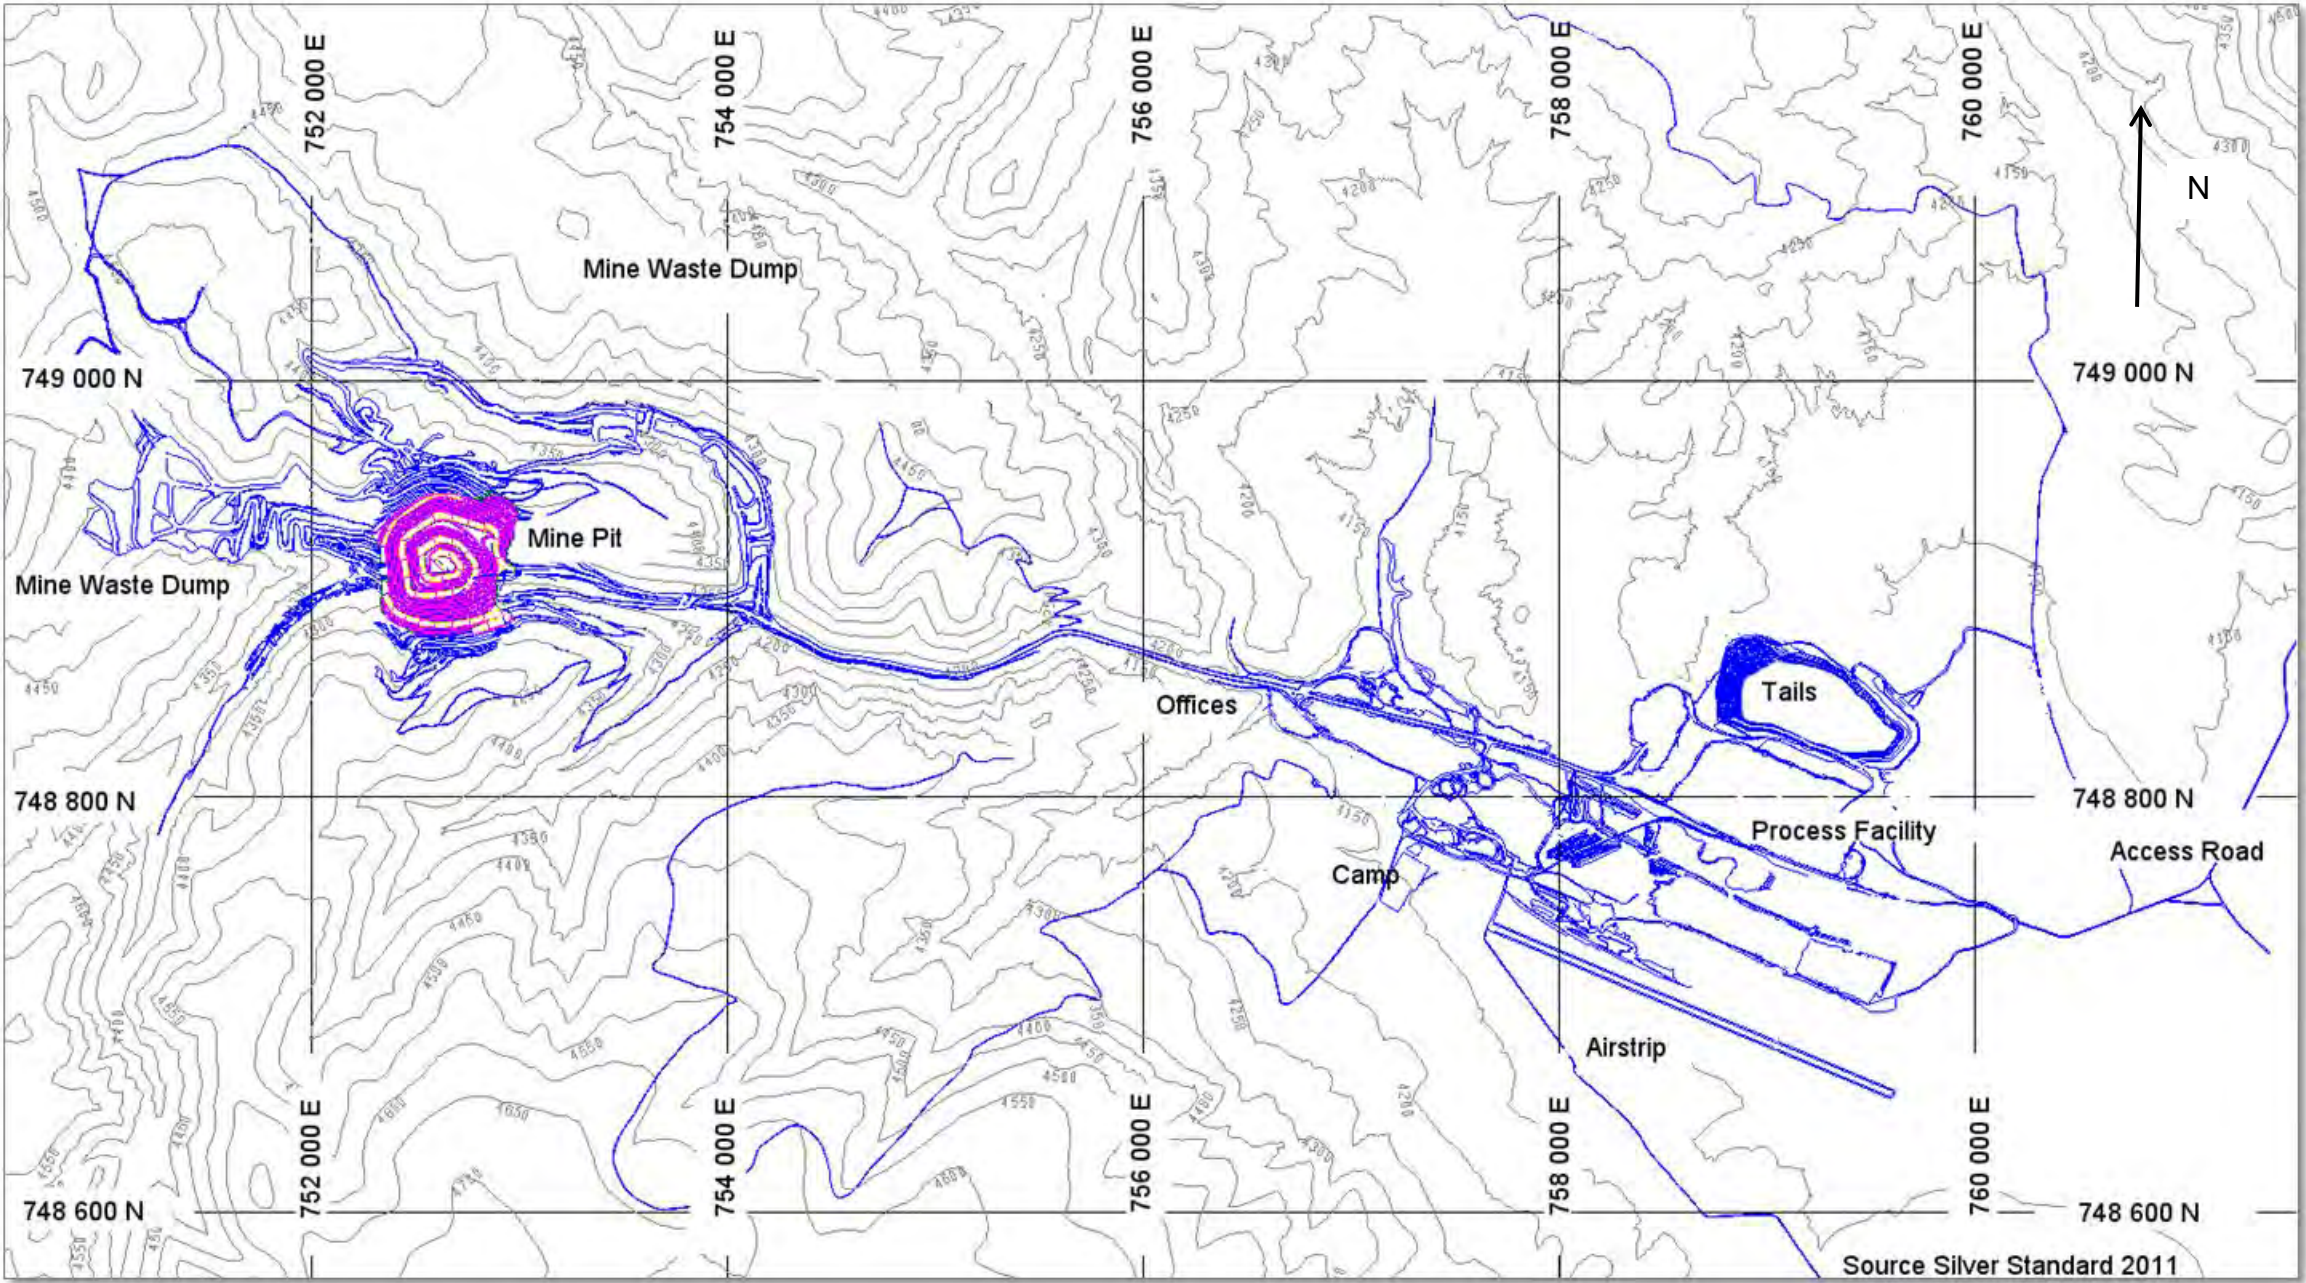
Pirquitas Mine, Site Plan with contour lines
